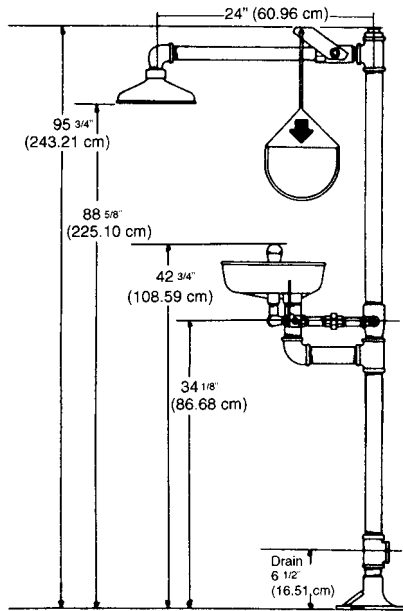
Detail of typical combination shower, eyewash, and drench shower.
